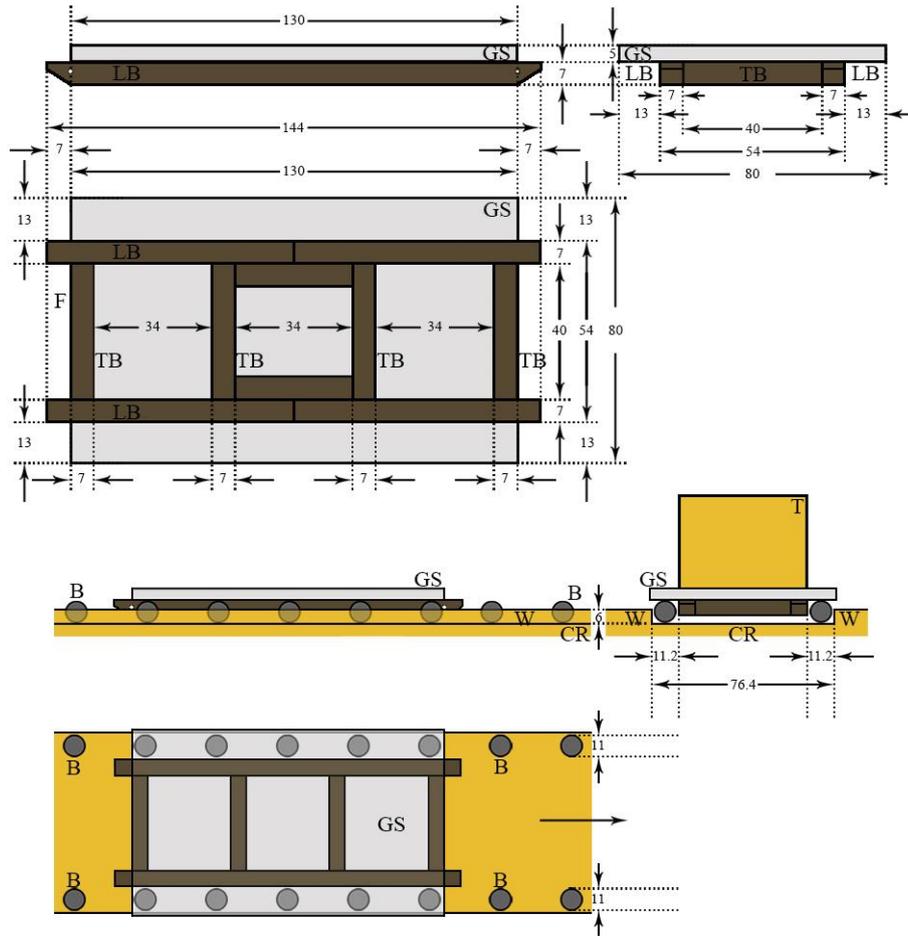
The proposed system showing the dimensions of its required components. B = Granite ball; W = wall flanking concrete road; F = Frame; GS = granite slab. CR = concrete road; LB = lateral beam of the frame; TB = transverse beam of the frame; T = tile load. All dimensions are in centimeters.
